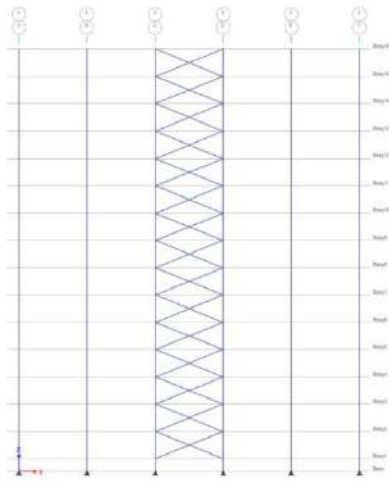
conventional slab building vertical irregularity with bracing at centre
